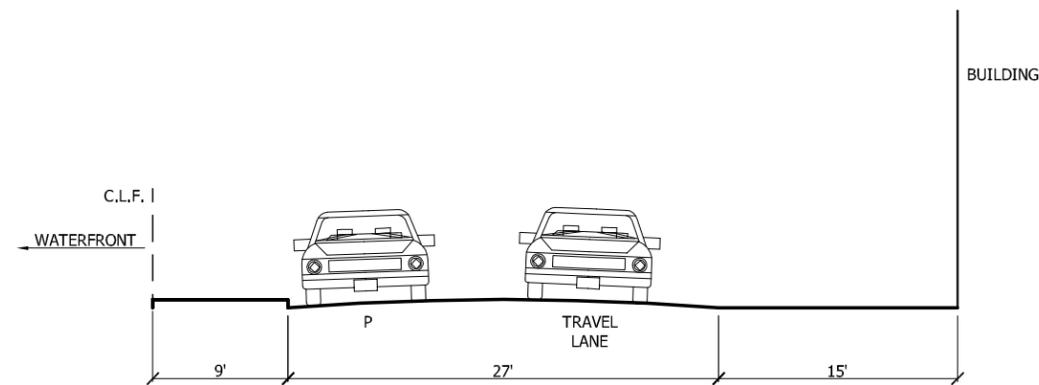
Existing configuration on Halleck Street between Court Street and Smith Street
